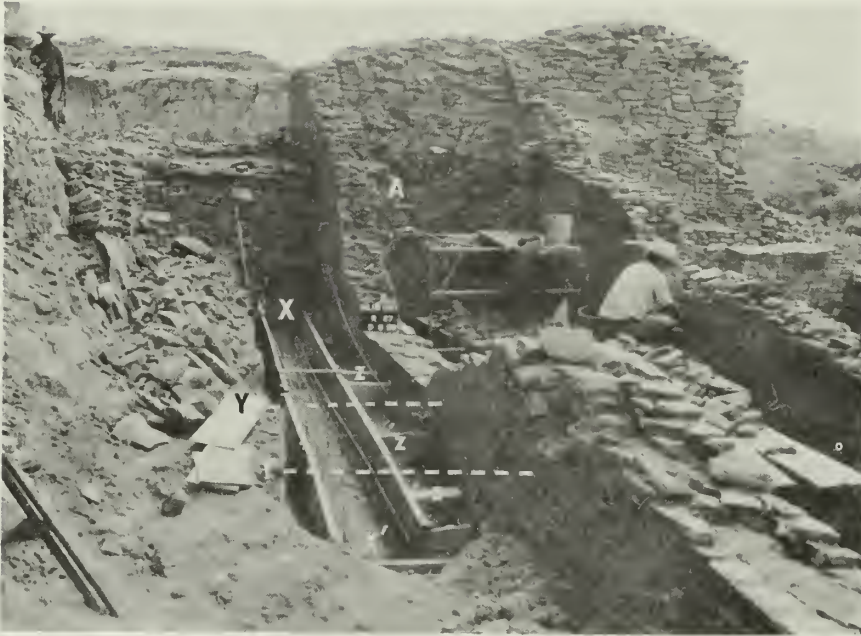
Construction of concrete beam shown in figure 121. The frame is complete and reinforcing rods are in place. X—X1- beam, Y—location of threaded rods and turnbuckles, Z—temporary braces. The ends of the beam bear against the wall at each side of the bulged area at points where the wall is braced against movement by partition walls. That at the east shown as A.
